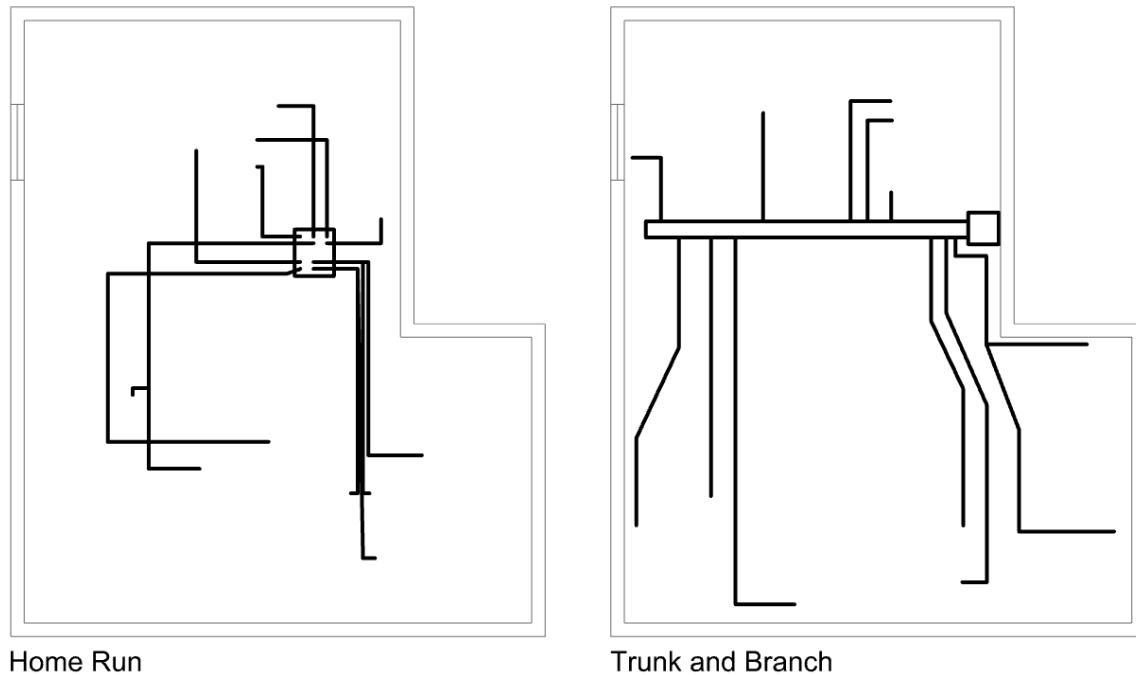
Duct layouts: PnP (left) and trunk-and-branch (right)
